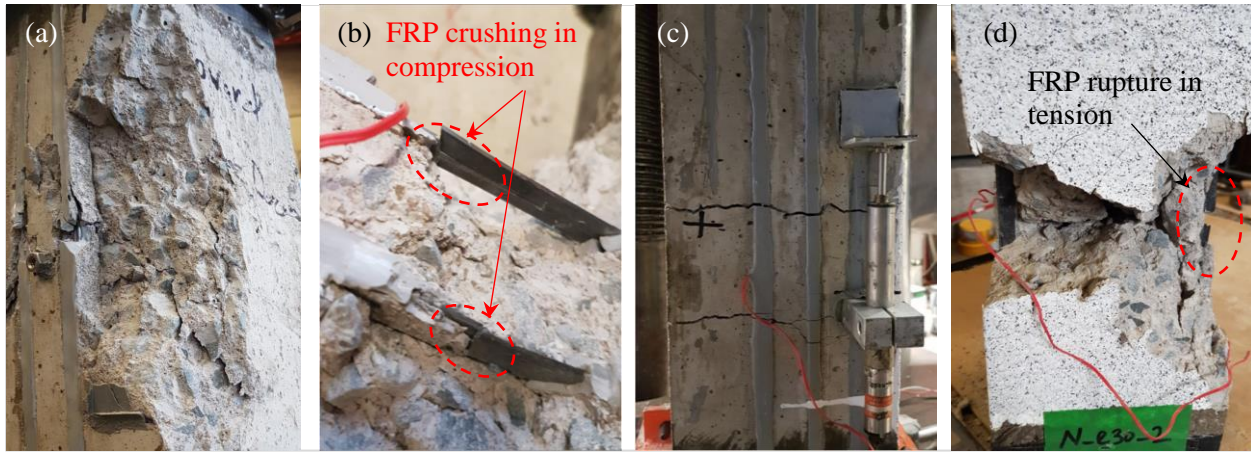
Modes of failure: (a) concrete spalling (CS); (b) compressive FRP crushing (CFC); (c) tensile cracks; and (d) tensile FRP rupture (TFR).
